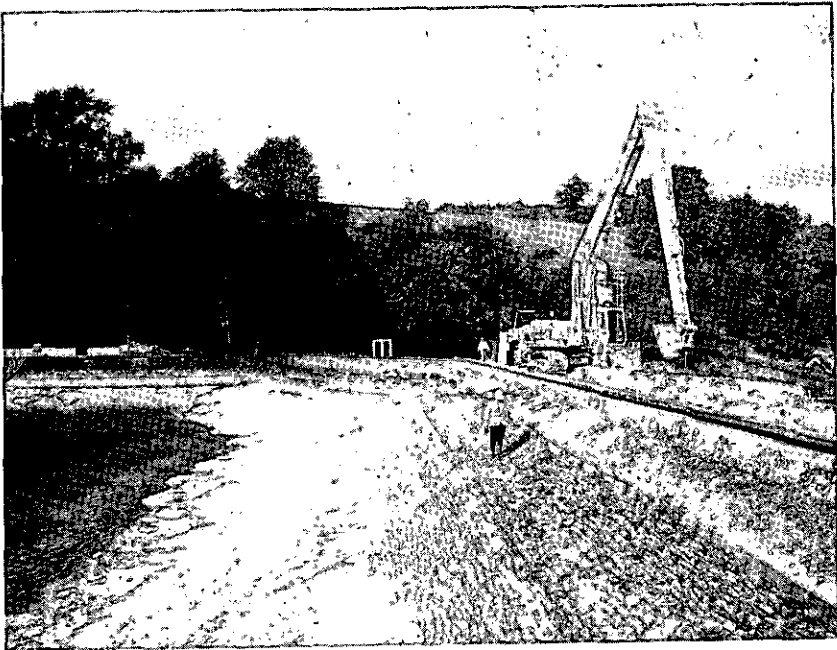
Installation of slurry trench cut-off wall at Monkswood dam
